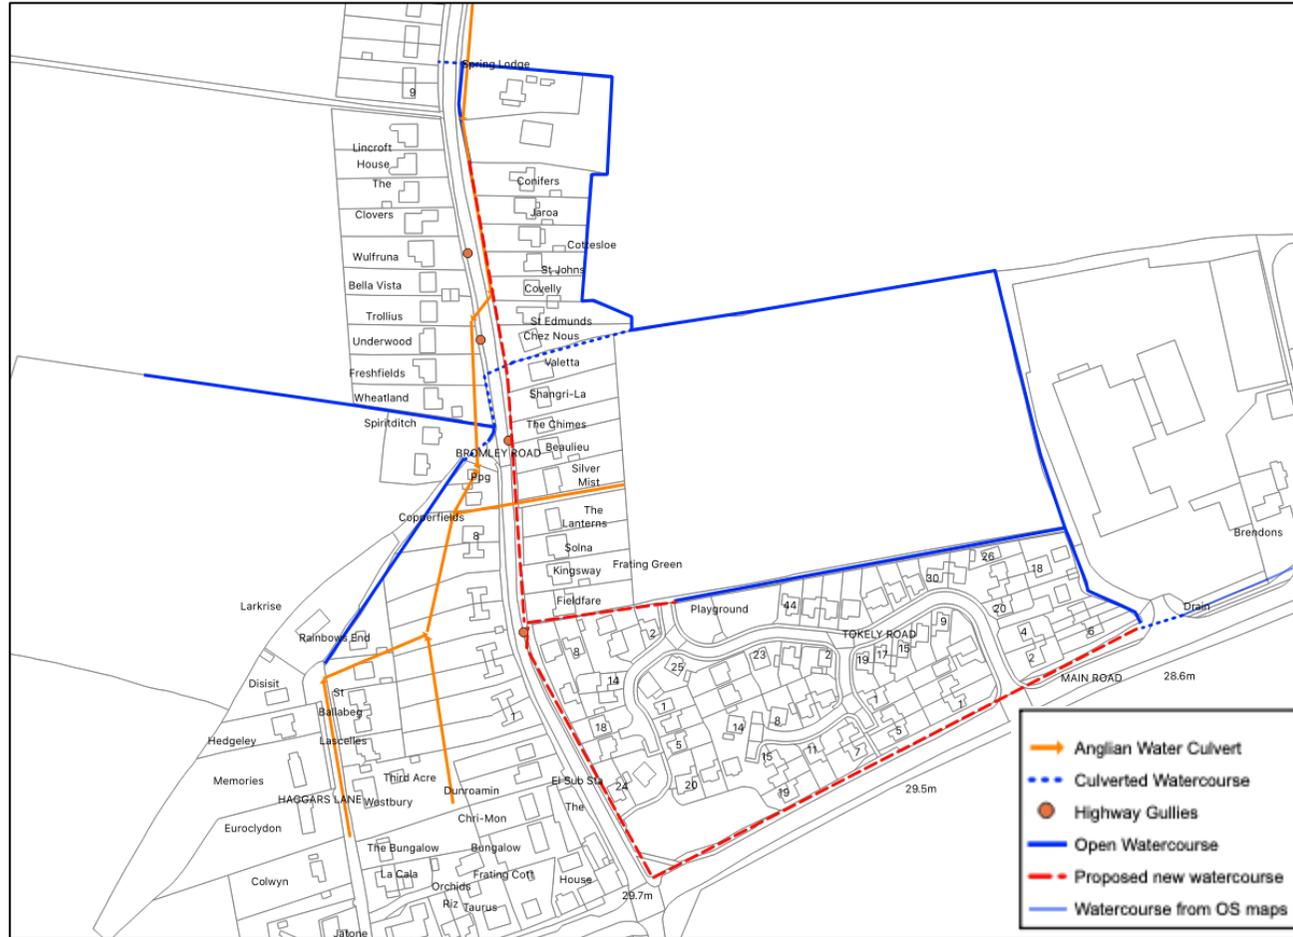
Indicative Drainage Layout (Ordnance Survey, 2021).
